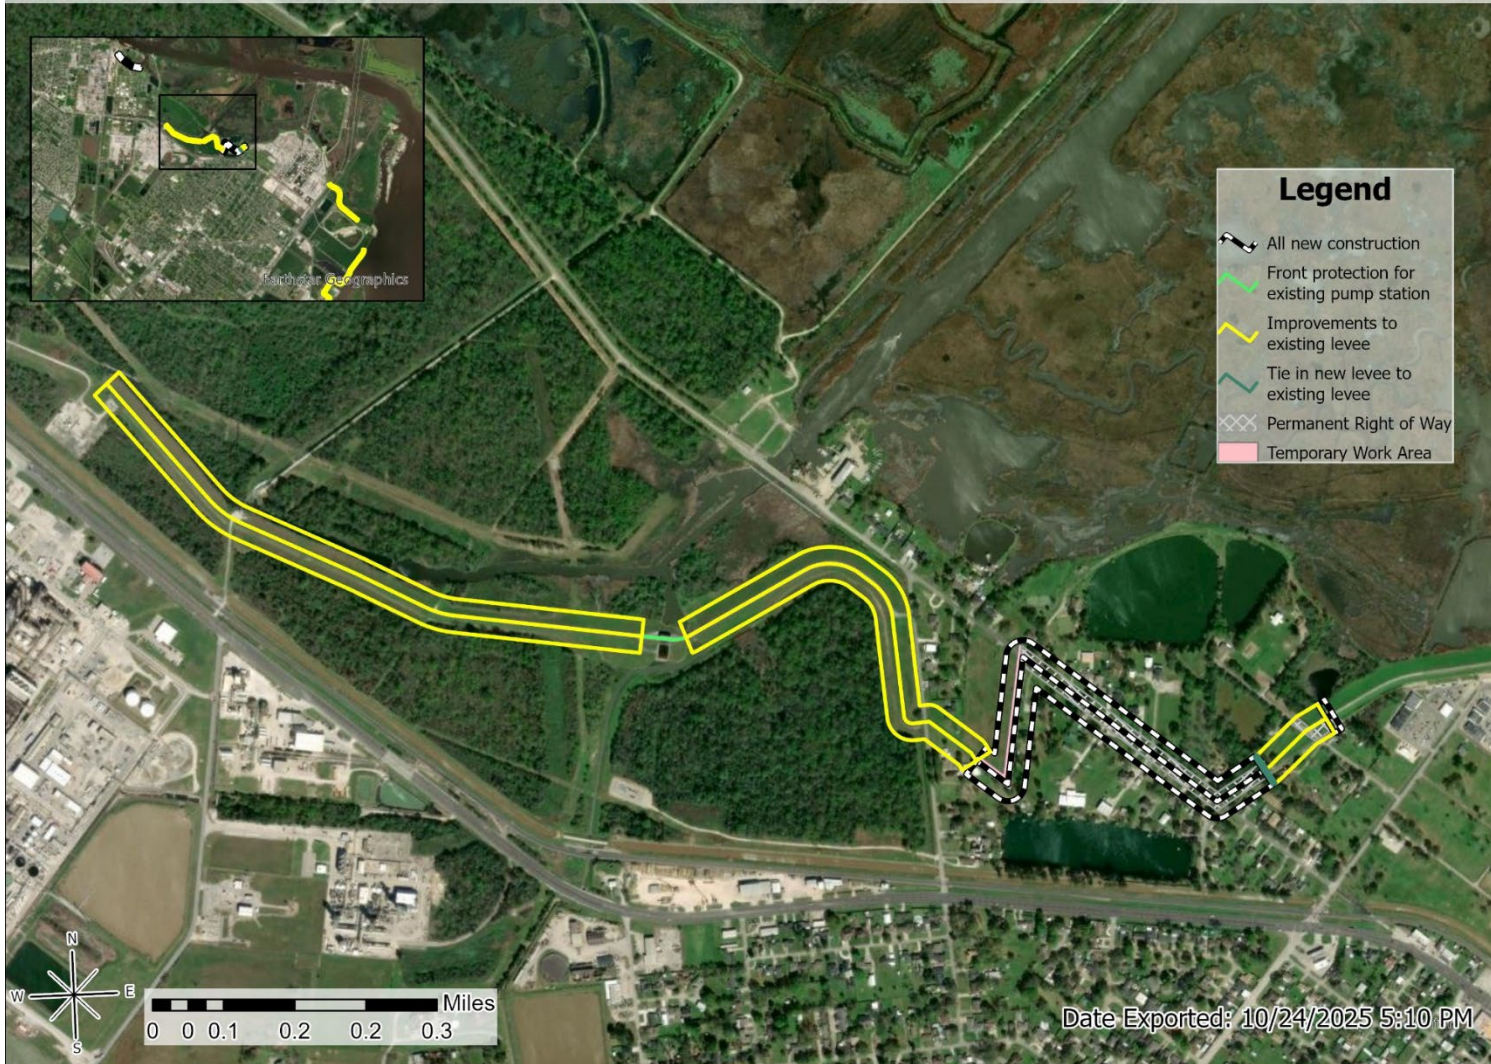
New levee construction, fronting protection of existing pump station and improvements to existing levee.
